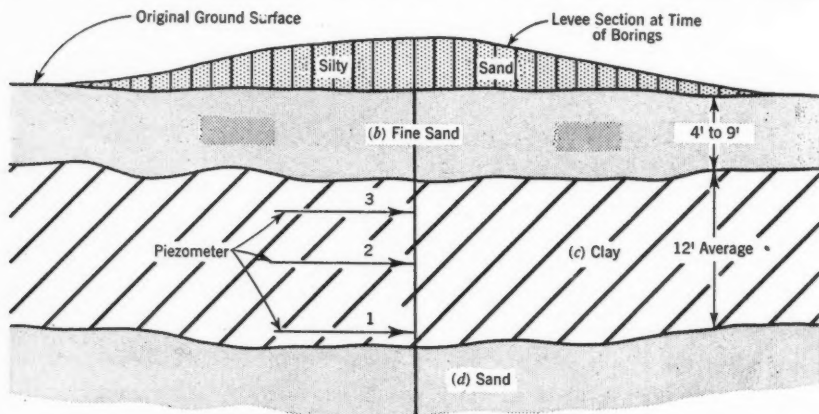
GENERALIZED FOUNDATION CROSS SECTION
